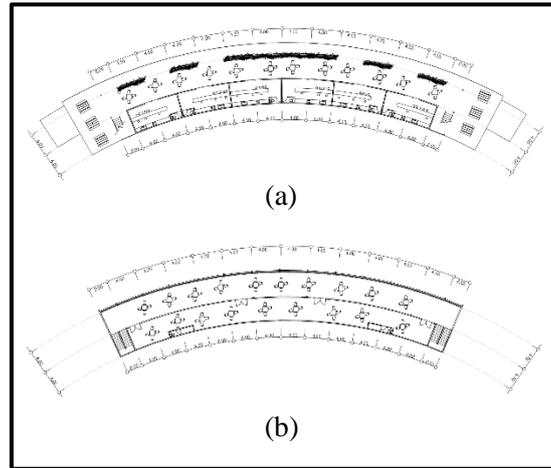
(a) 1st Floorplan of Café; (b) 2nd Floorplan of Café
